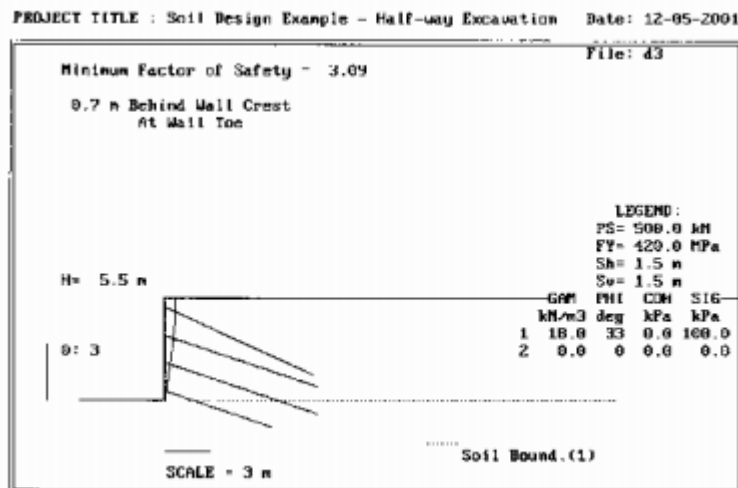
Load Case 3: Excavation Depth of H = 5.5 m.
